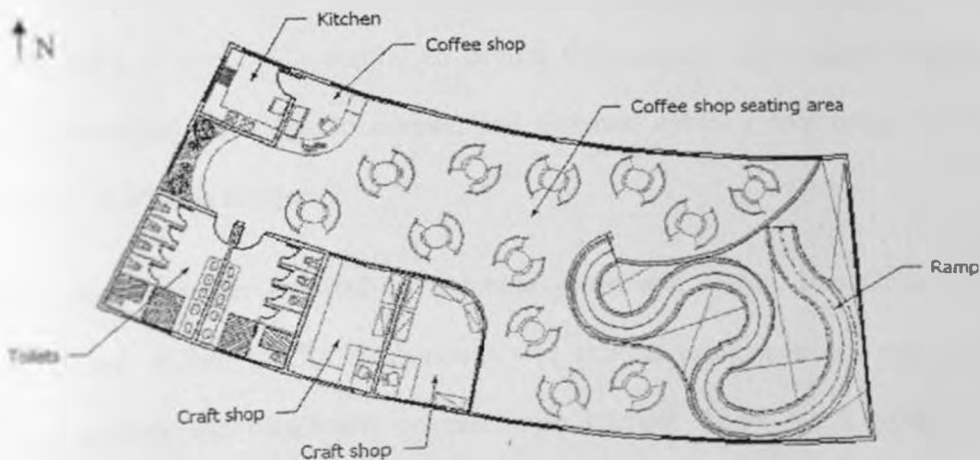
21 – Restaurant building first floor layout plan. Source: Author, 2013.
